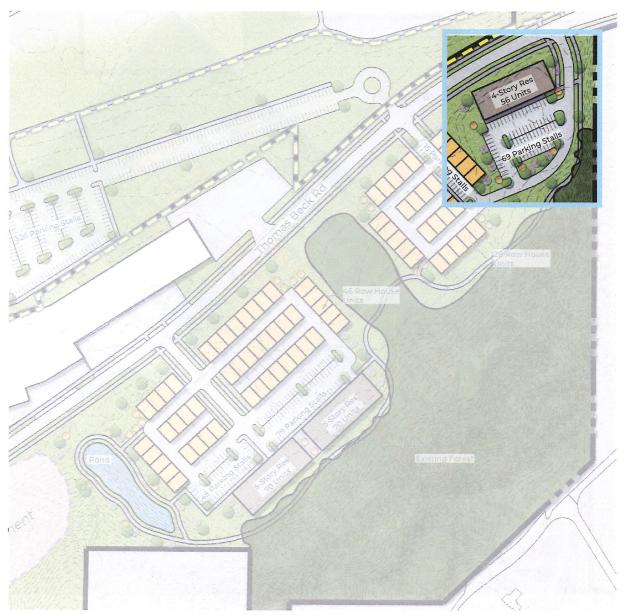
Final South of Gray's Lake Master Plan - Thomas Beck Road Multi-Family
